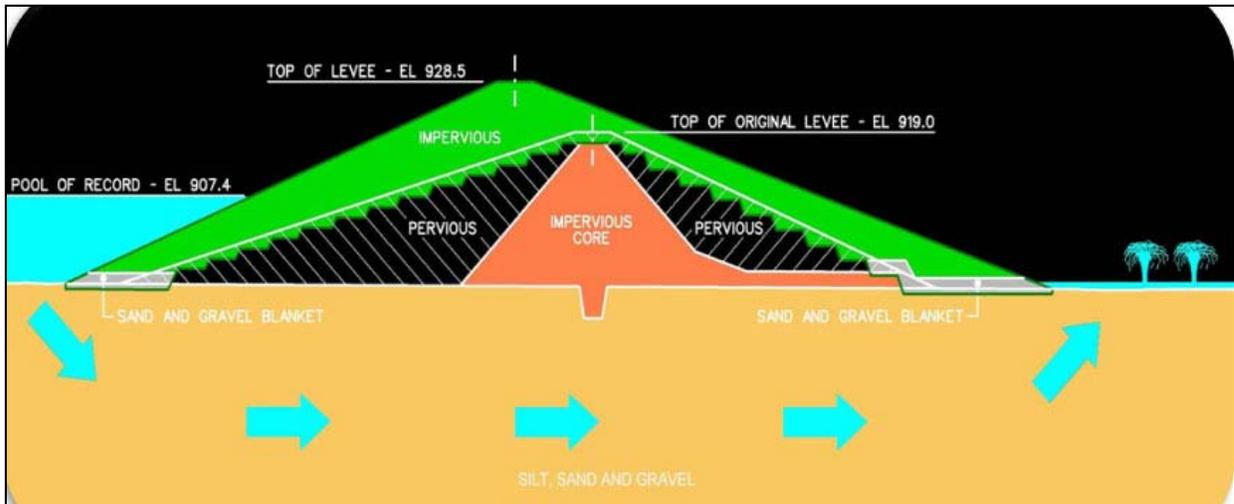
Typical cross-section of Zoar Levee demonstrating under seepage.
